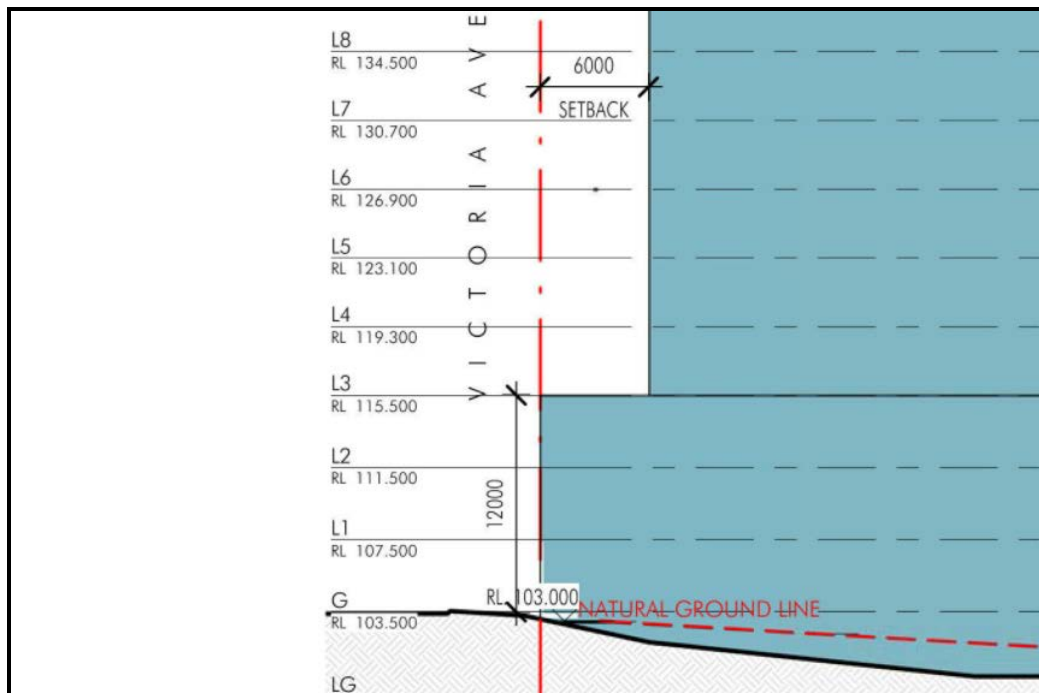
Proposed Setback from Victoria Avenue (extract from DA plans)
